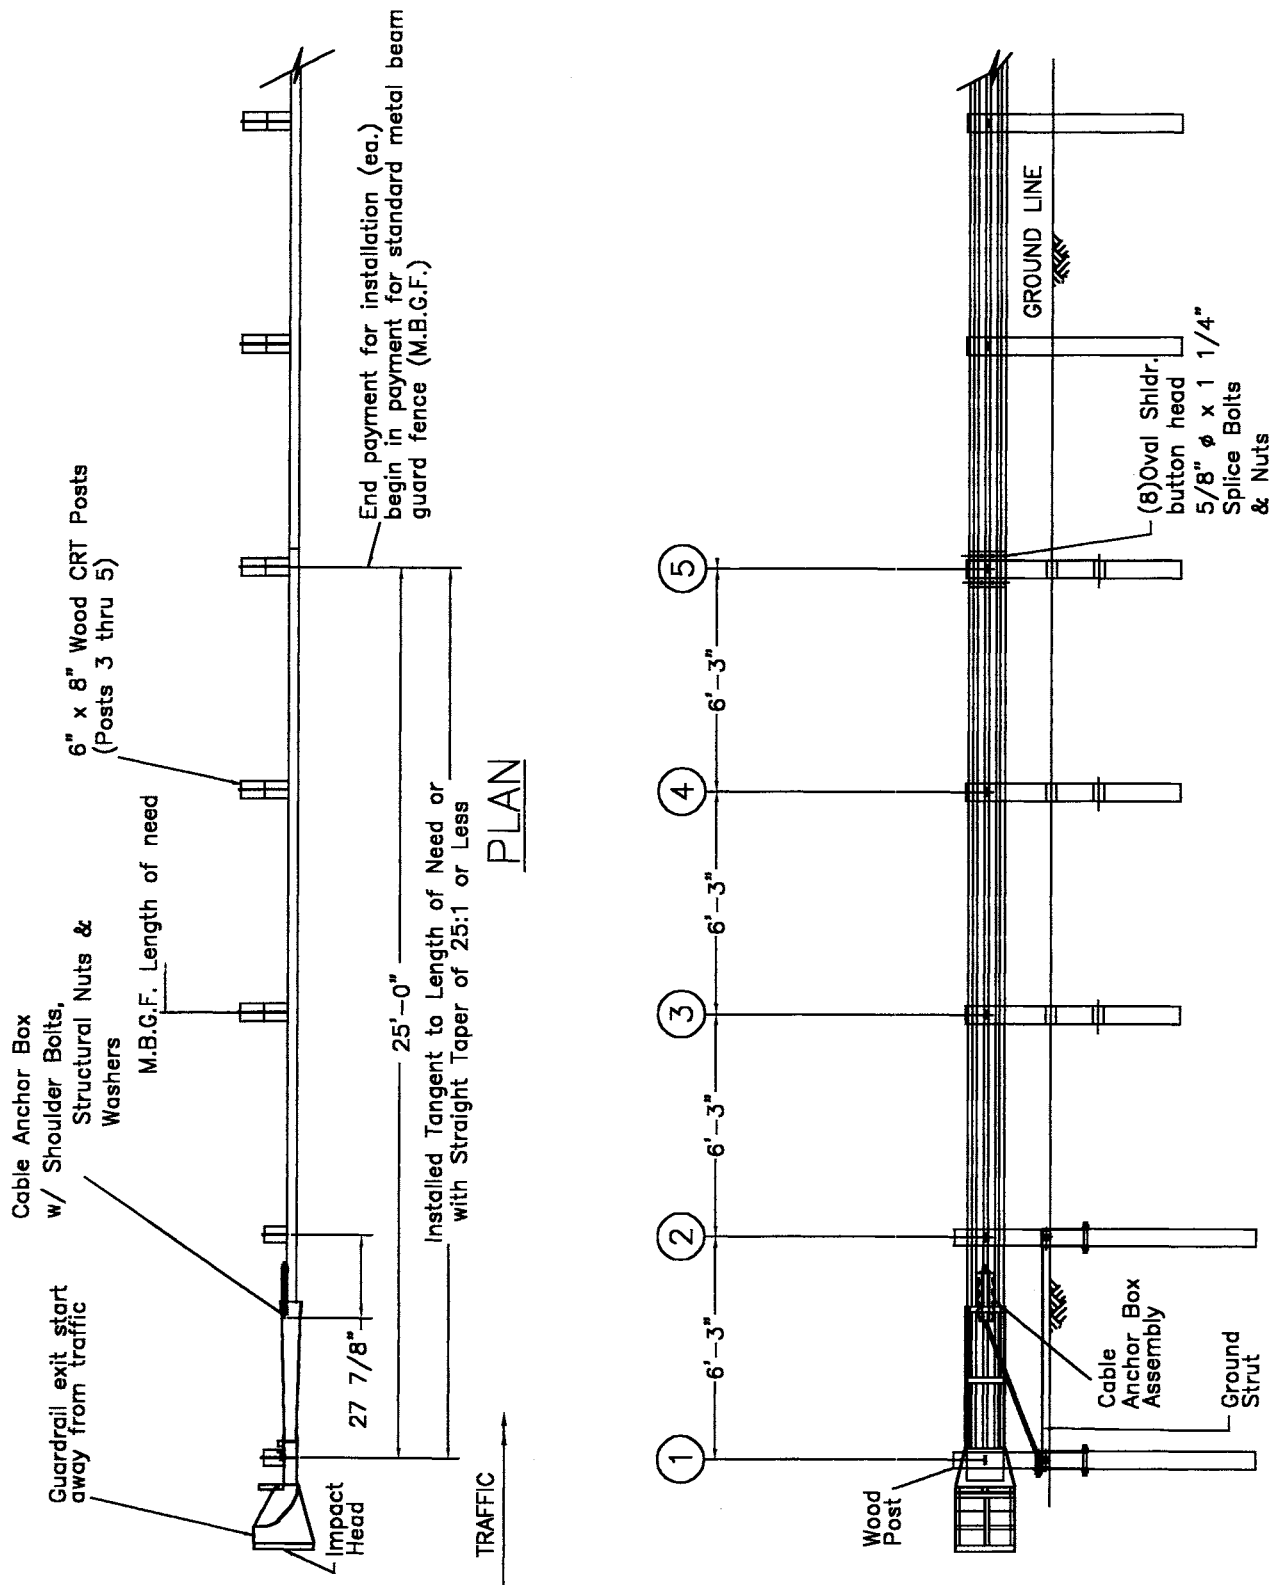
Plan and Elevation View of Test Level 2 SKT System
